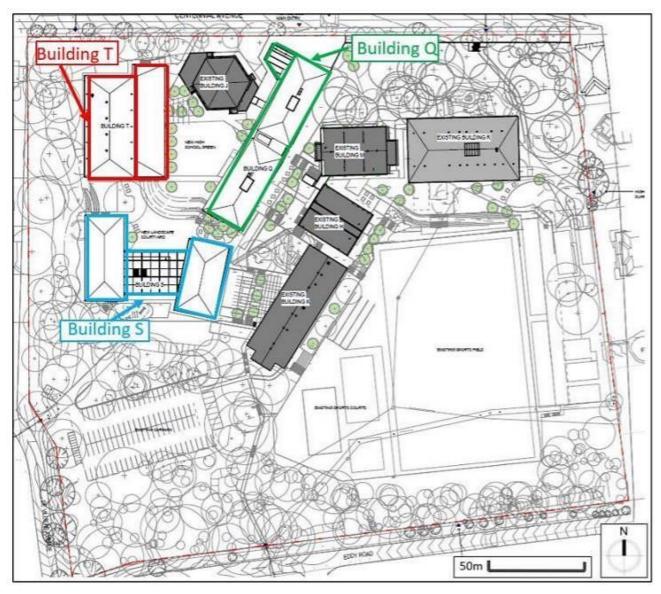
Chatswood High School Site Plan (Source: EIS 2020)
